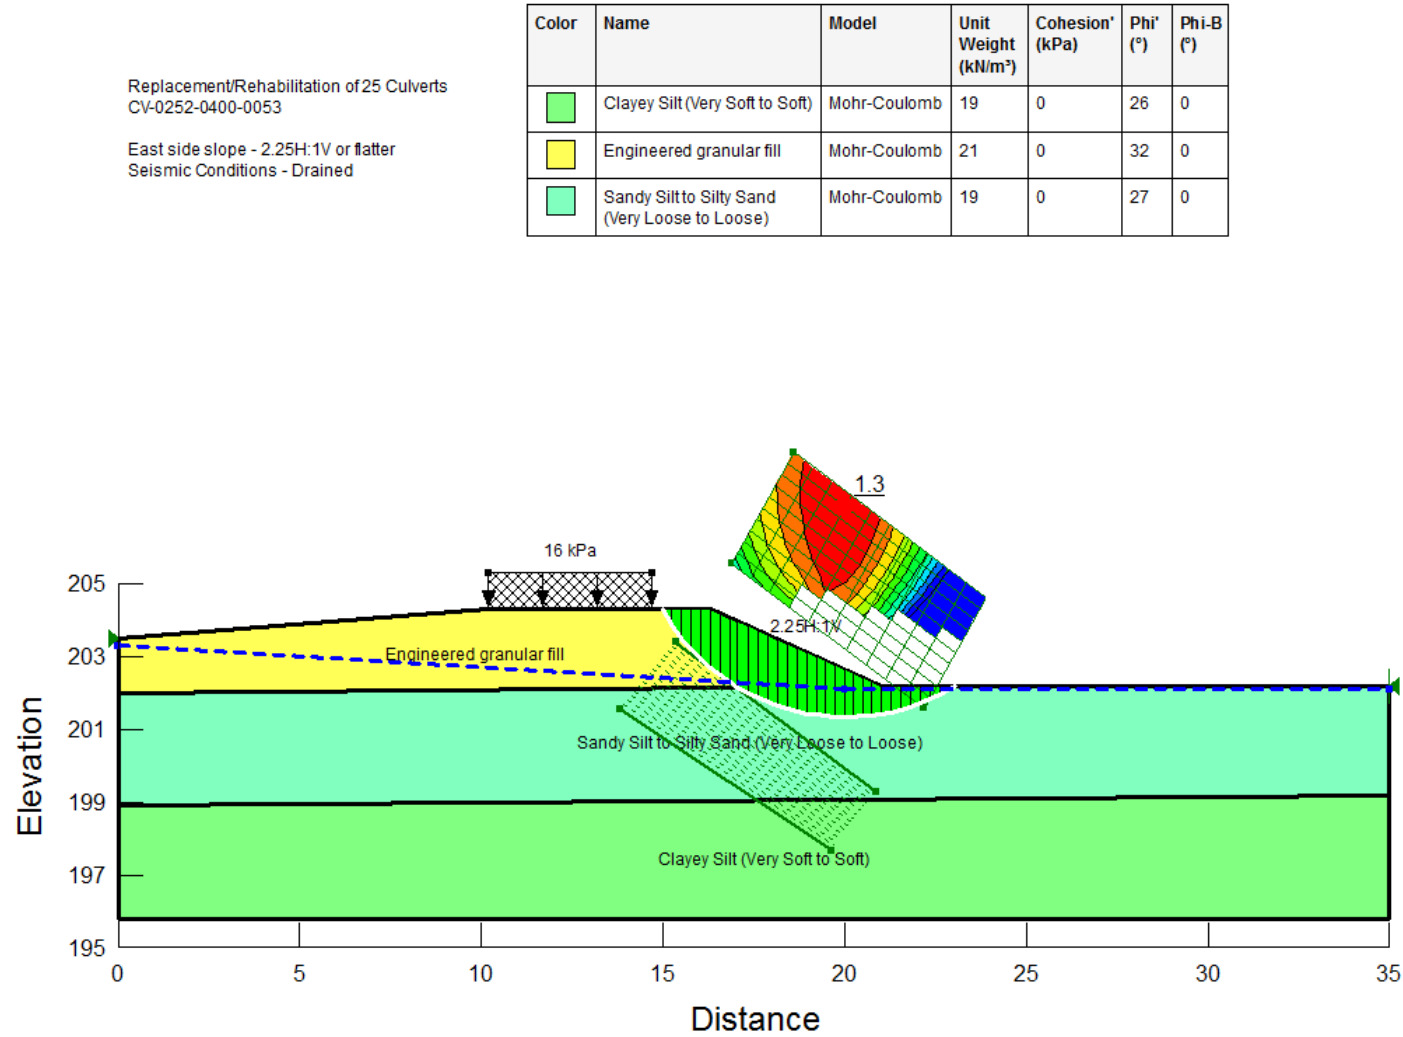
Slope stability analysis for new embankment reconstructed on east side slope with minimum 2.25H:1V or flatter to match existing 3.3H:1V – drained seismic condition
